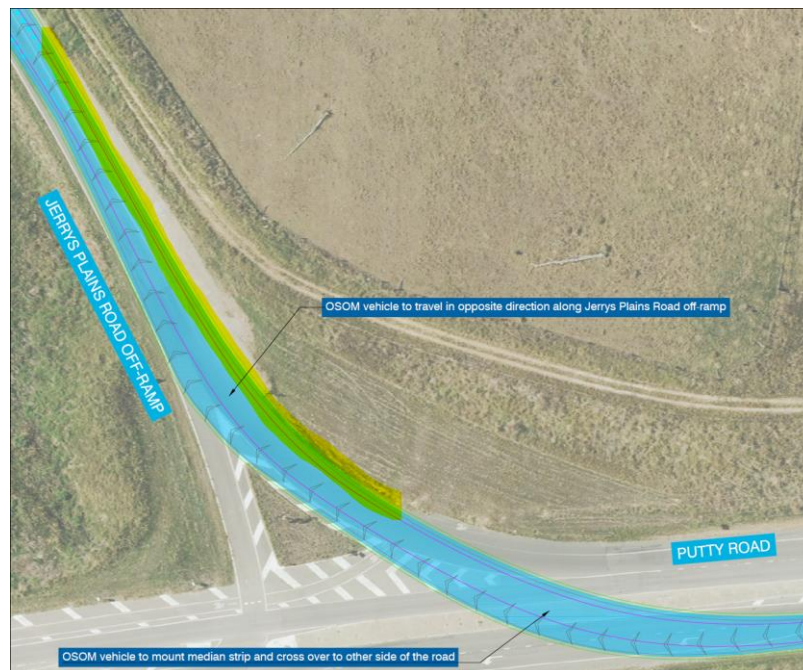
Vehicle chassis outline beyond paved road area (indicated with highlight) at Putty Road/Mount Thorley Road/Jerry's Plains Road, Mount Thorley. Source: OSOM Assessment DRG EMM-009.
